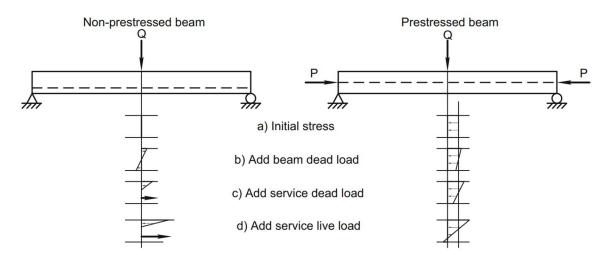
Stress profiles encountered at beams during different stages (Reinforced Concrete to the left, Prestressed Concrete to the right) [16]
